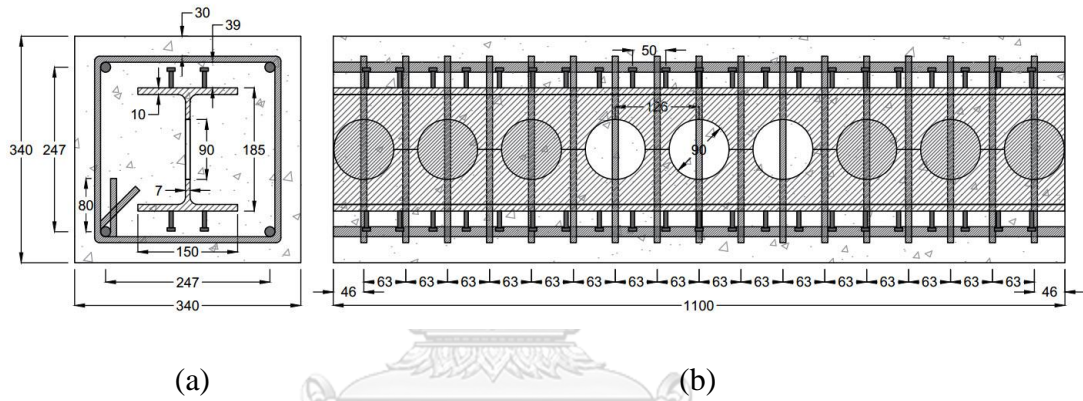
Reinforcement details of C1s-63, C1s-63-E1 and C1s-63-E2 columns; (a) cross-section; and (b) longitudinal section (dimensions in mm).
